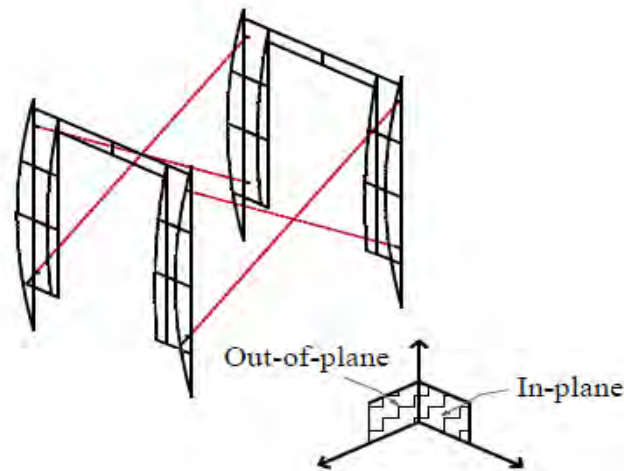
Typical mode of failure of single story door type scaffolding system [51]
